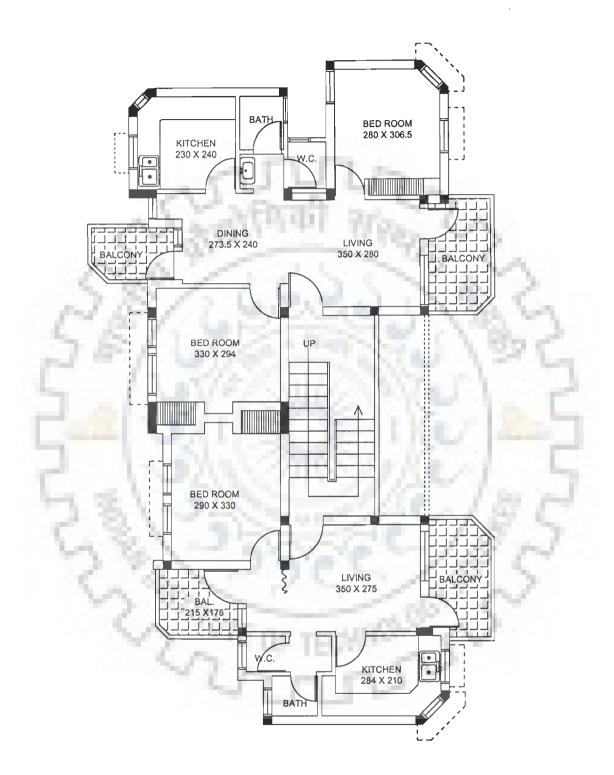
(f) - Typical Floor Plan of Type A-B, Project No. 14
